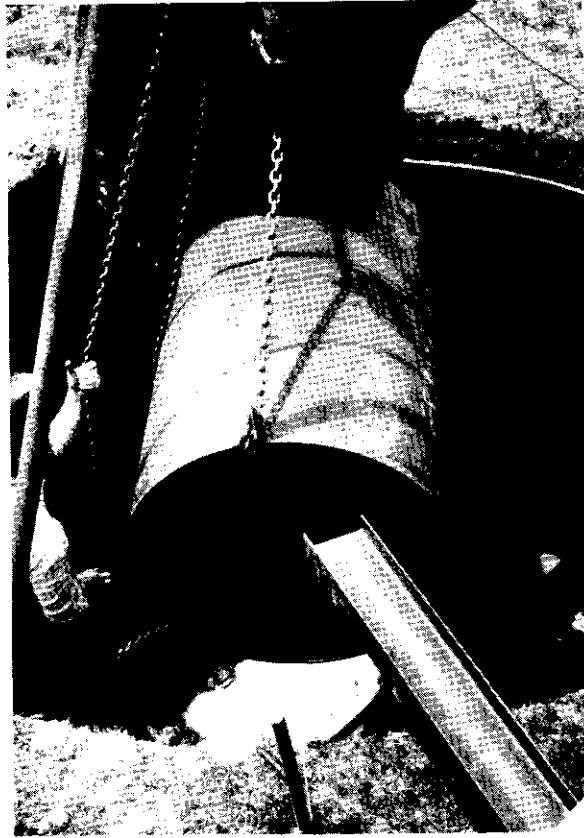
Lowering 5-inch section of 36-inch pipe for tunnel lining.
